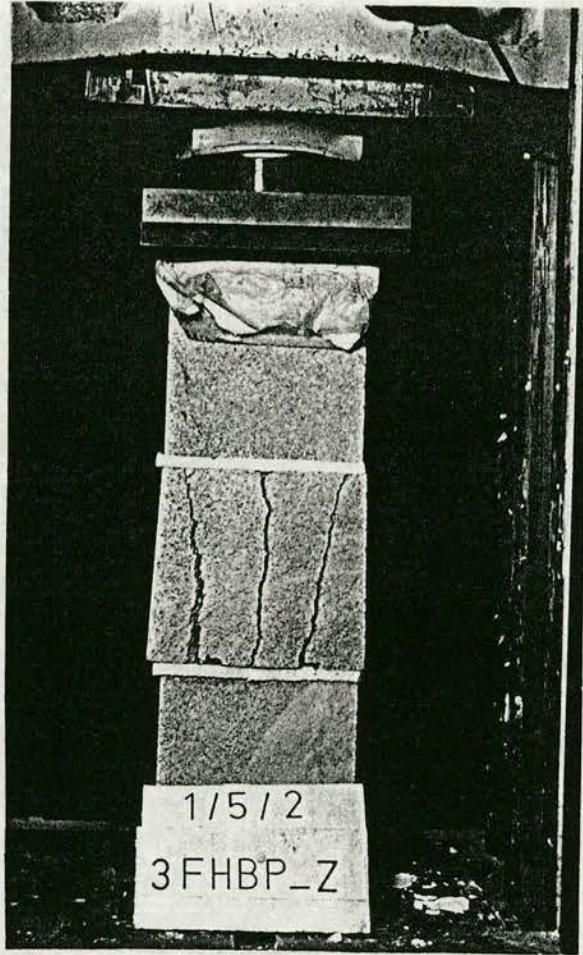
Filled 3HBP-PJ prism after failure,
